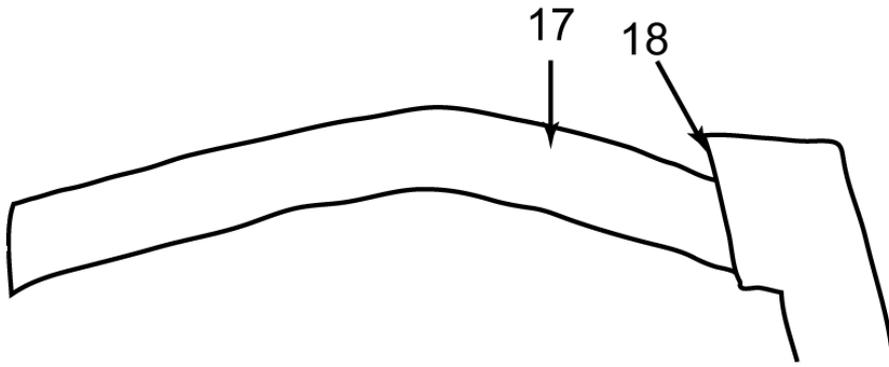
Hall, truss 11, north face, showing the location of samples 17 and 18
